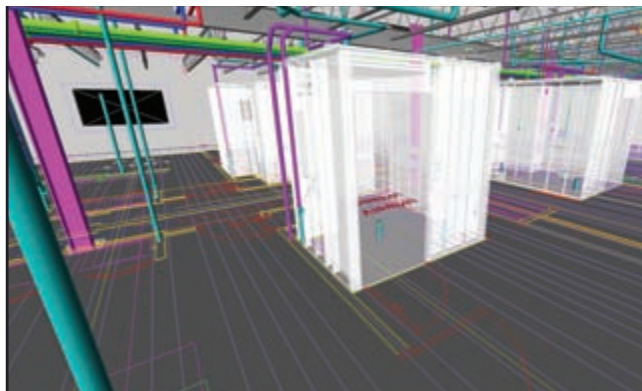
Building model with bathroom pods (Mortenson Construction, 2011)
